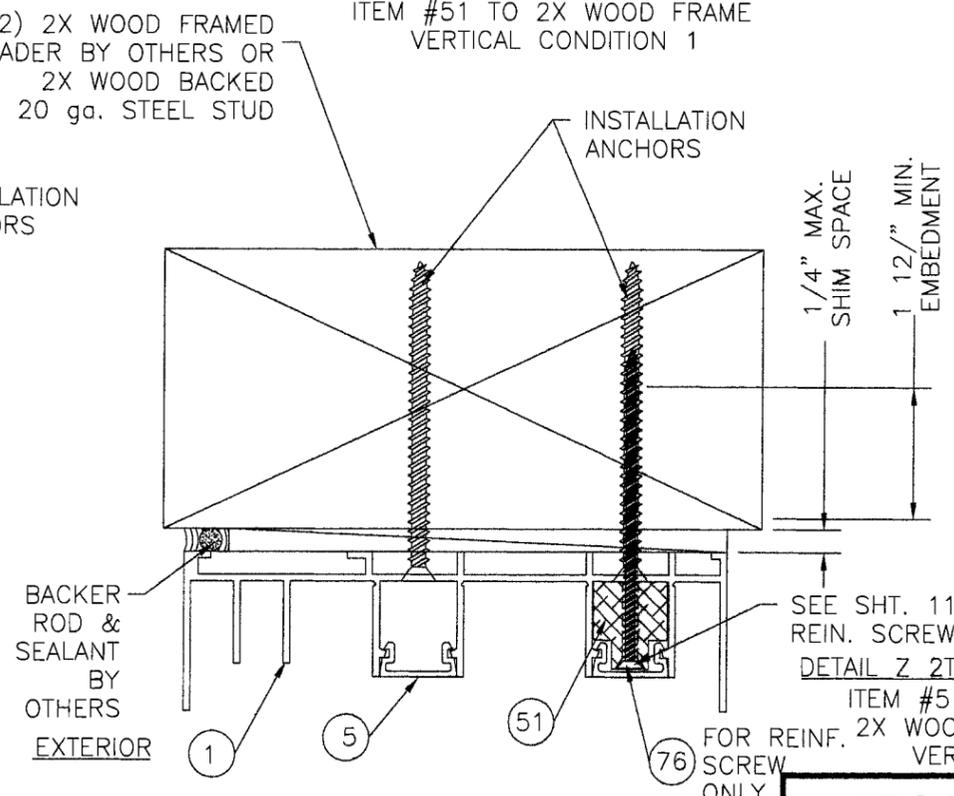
T WS/NS HEAD SECTION W/ ITEM #51 TO 2X WOOD FRAME VERTICAL CONDITION 1
